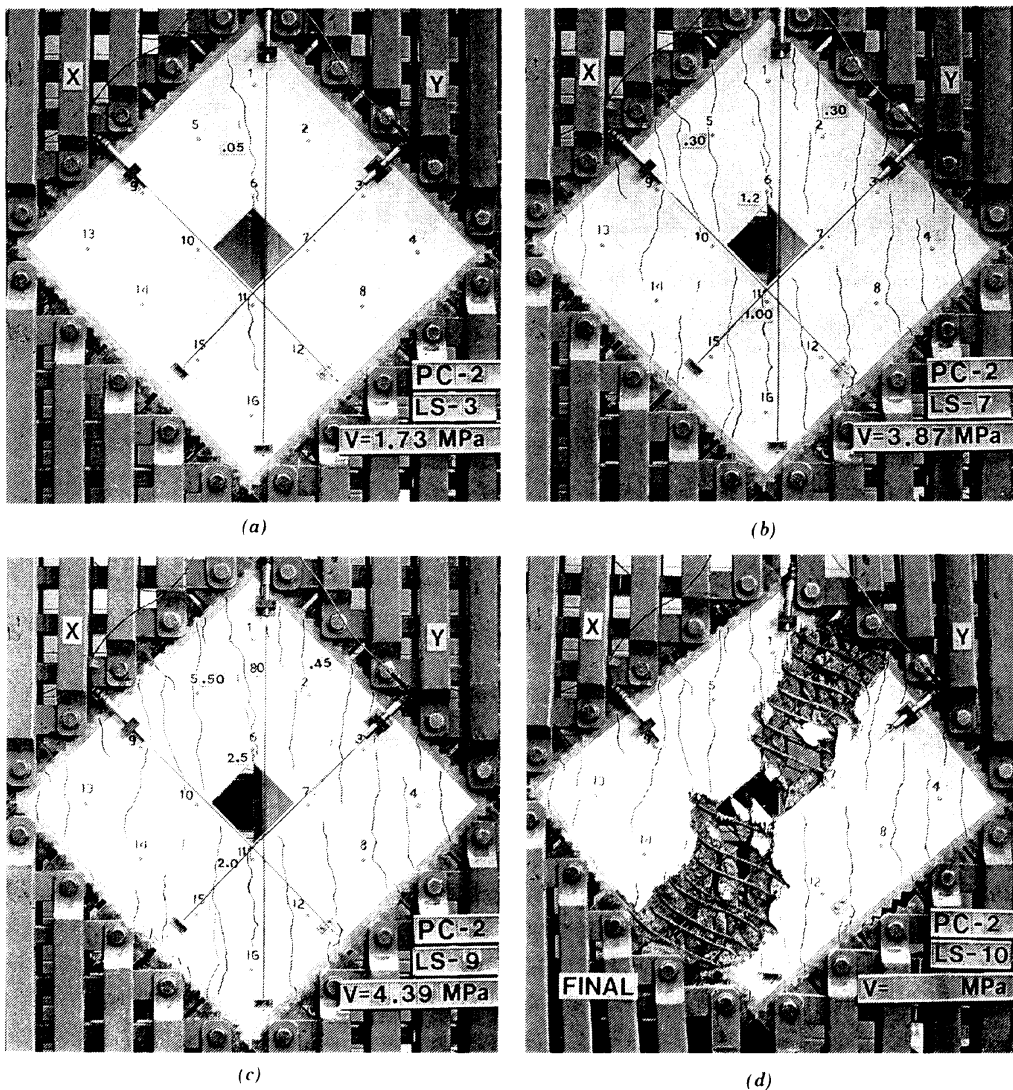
Photographs of Panel PC2 during Testing: (a) Initial Cracking; (b) Rebar Yielding at Opening; (c) Just Prior to Failure; (d) Shear/Crushing Failure
